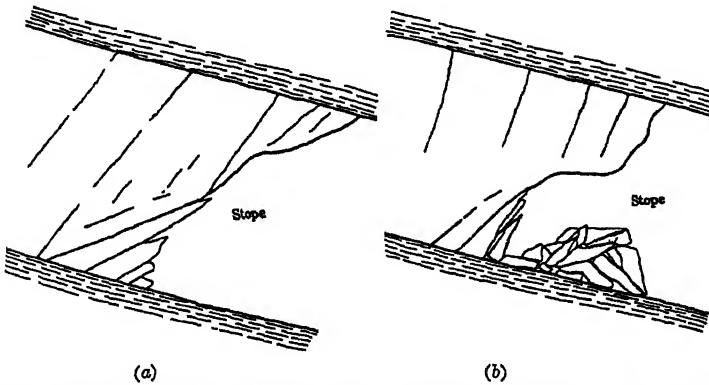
(a) UNDERCUTTING OF FACE OF PILLAR BY HEAVE. (b) UNDERCUTTING OF PILLAR BY FAILURE THROUGH FAILURE BY HEAVE.
